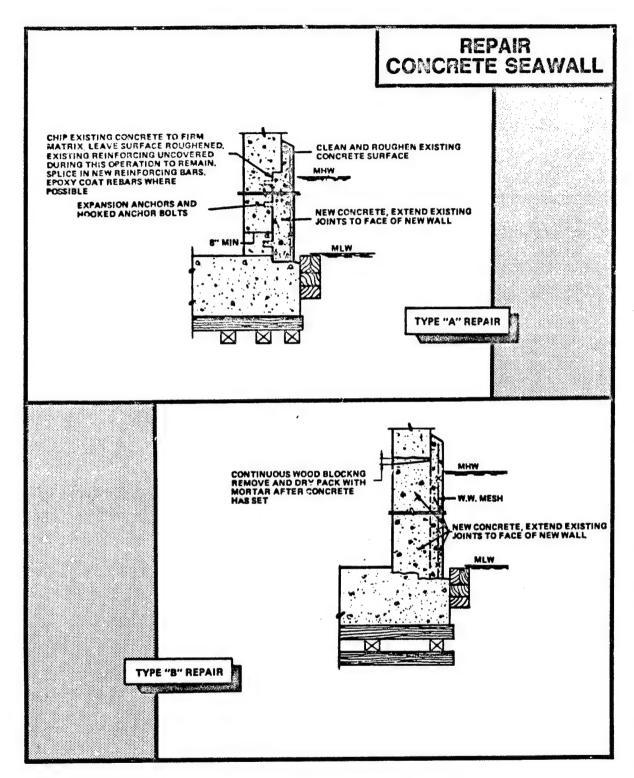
Repairs to Concrete Seawall. (Extracted from reference 7)
